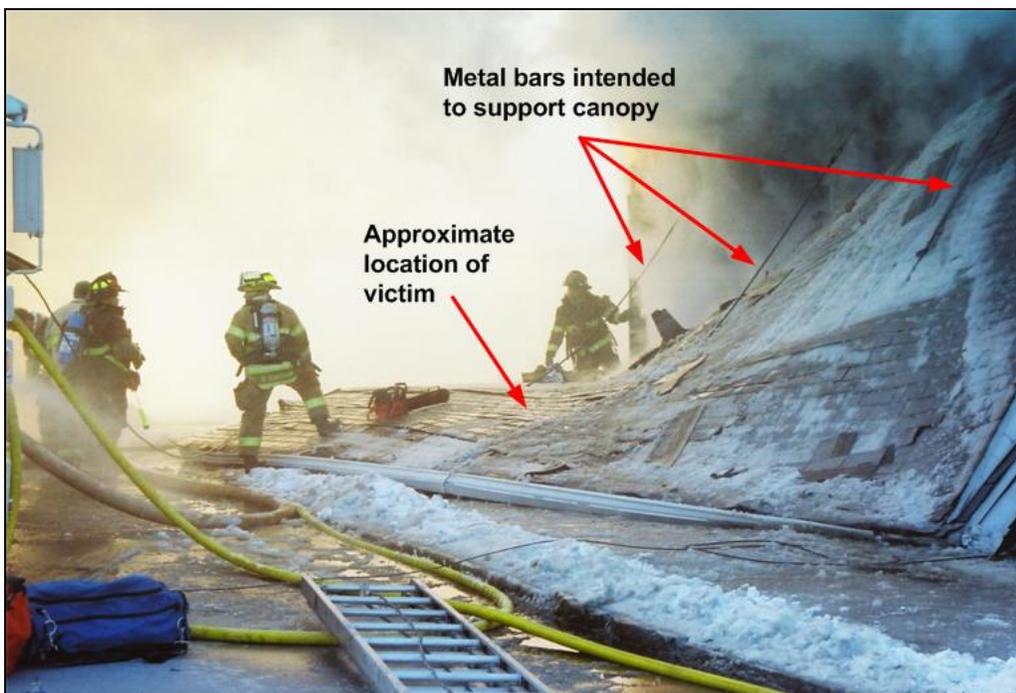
Canopy post-collapse, side D. Note failed metal support rods and turn-buckles. Photo courtesy of fire marshal's office
